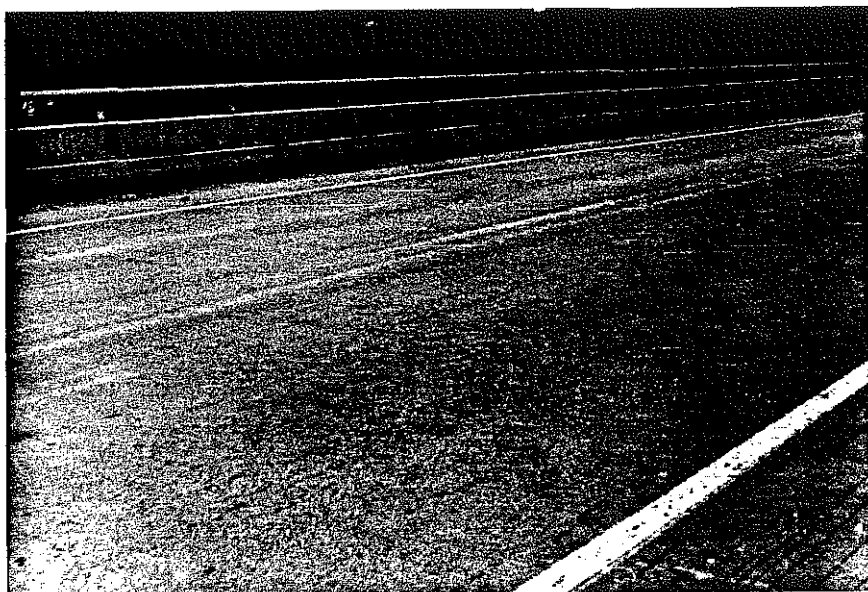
Latex Concrete Overlay, US 119 over Poor Fork
